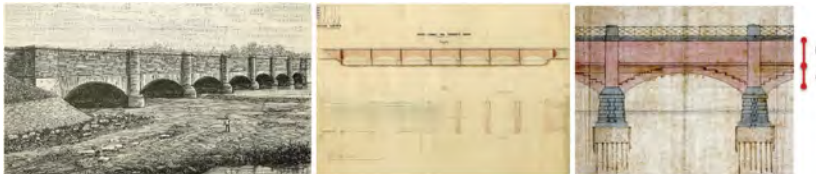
Bridge on torrent Cervo after construction around 1863, drawings of the original bridge project.
